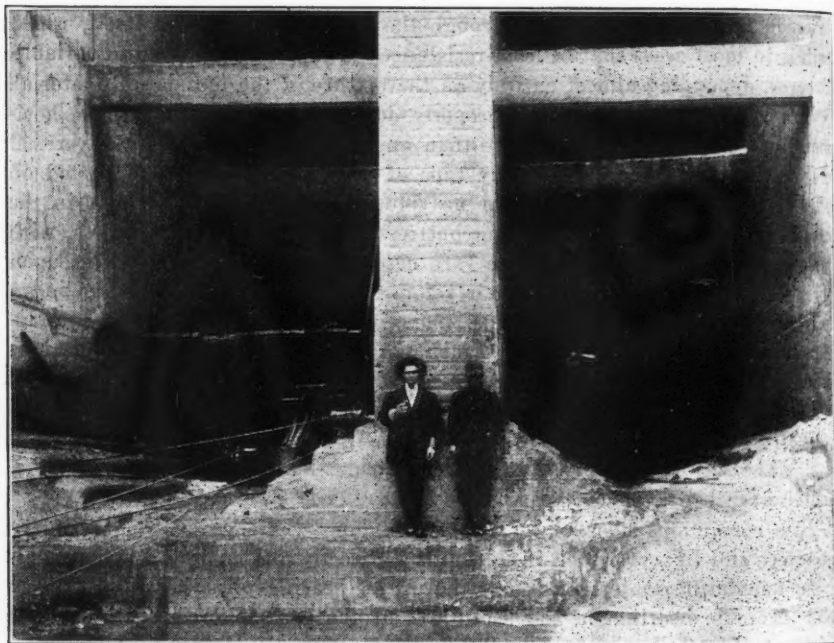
TYPICAL AMBURSEN FLOOR-SLAB UNDER DAM 135 FEET HIGH, LA PRELE, WYOMING; CLAY AND HARDEAN FOUNDATIONS; BUILT IN 1908.
